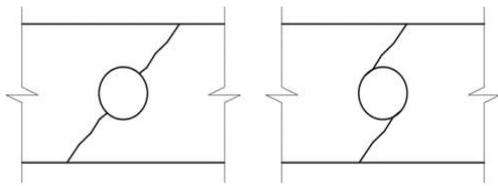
Schematic drawing showing failure modes of a beam with (a) small and (b) large openings in the flexure zone [32]
